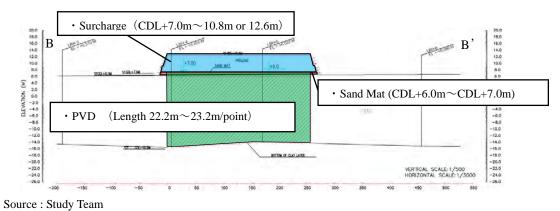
Section of Soil Improvement (B-B' section)
